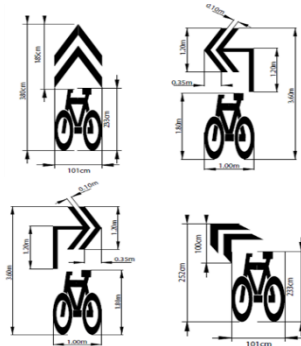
Pavement Markings. Purpose: Can support wayfinding signage to ensure turns are not missed and can assist with cycling positioning along shared facilities.
